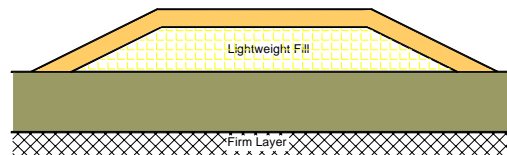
Cross-section through a lightweight fill installation. (G. Smith)
